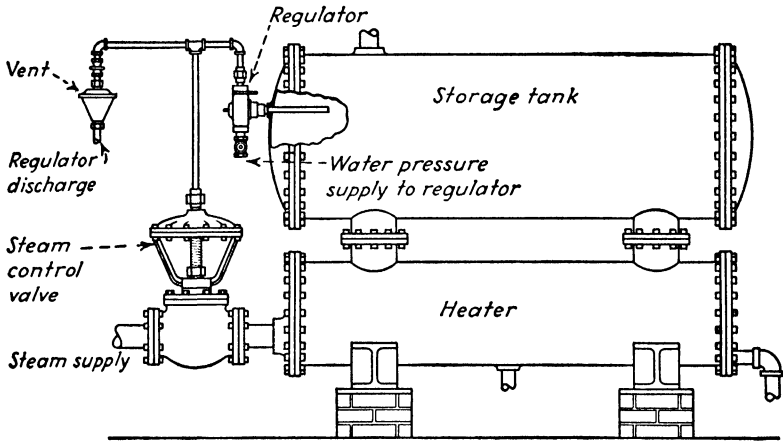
Thermostatic regulator controls steam-flow valve hydraulically. (Courtesy of Atlas Valve Co.)
